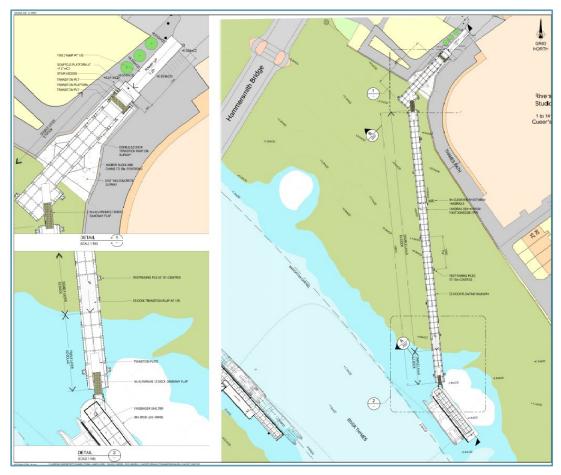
Hammersmith pier detail Source: Beckett Rankine, drawing 2005
